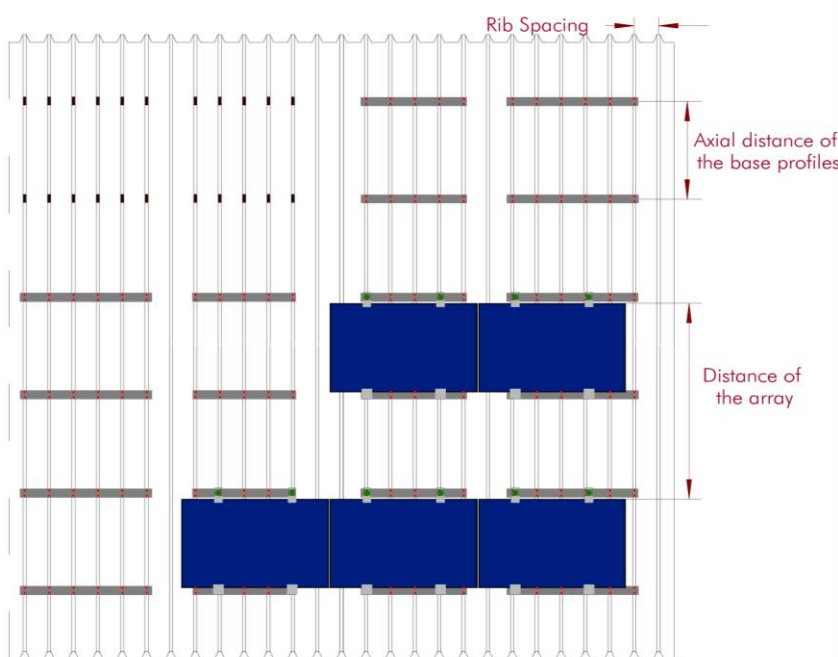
Schematic drawing on fastening the base profiles to the trapezoidal sheet- Reinforced fastening
